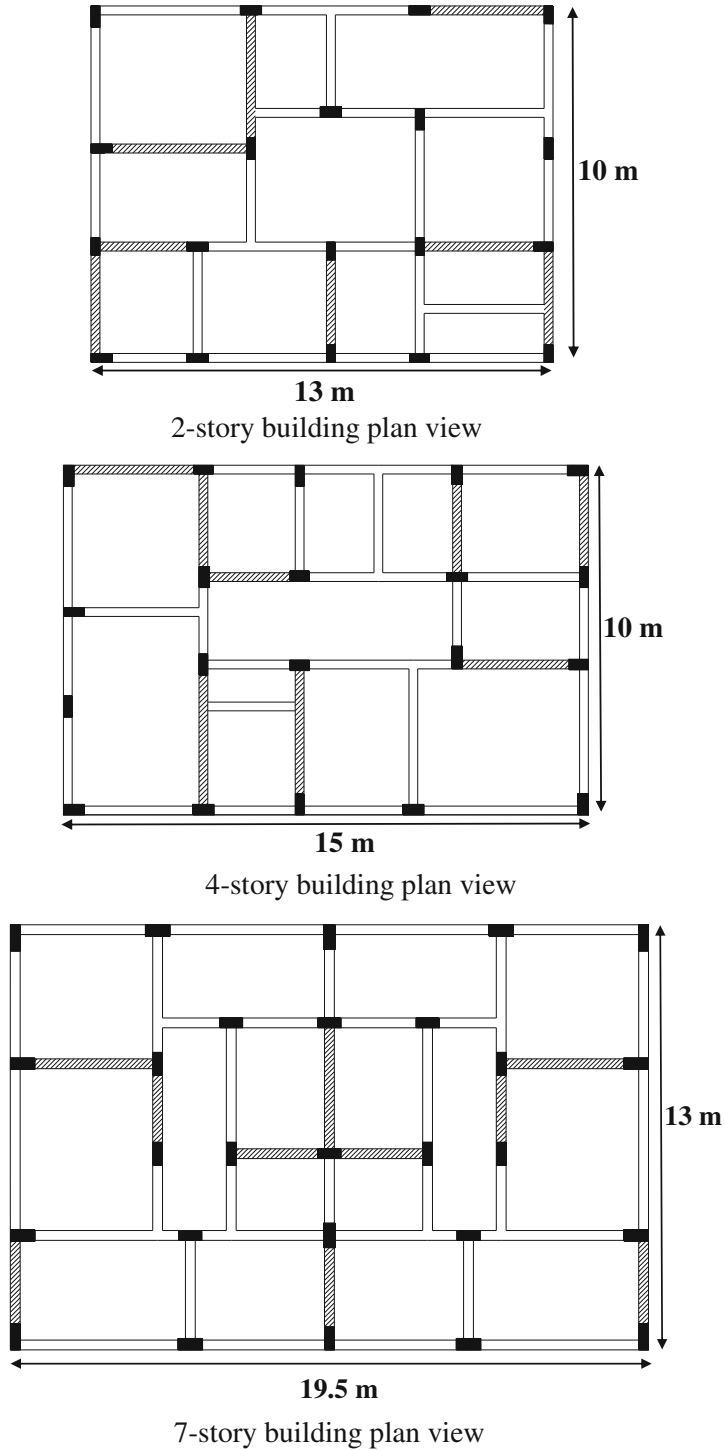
Plan view of the considered buildings (load carrying infill-walls are shaded).
